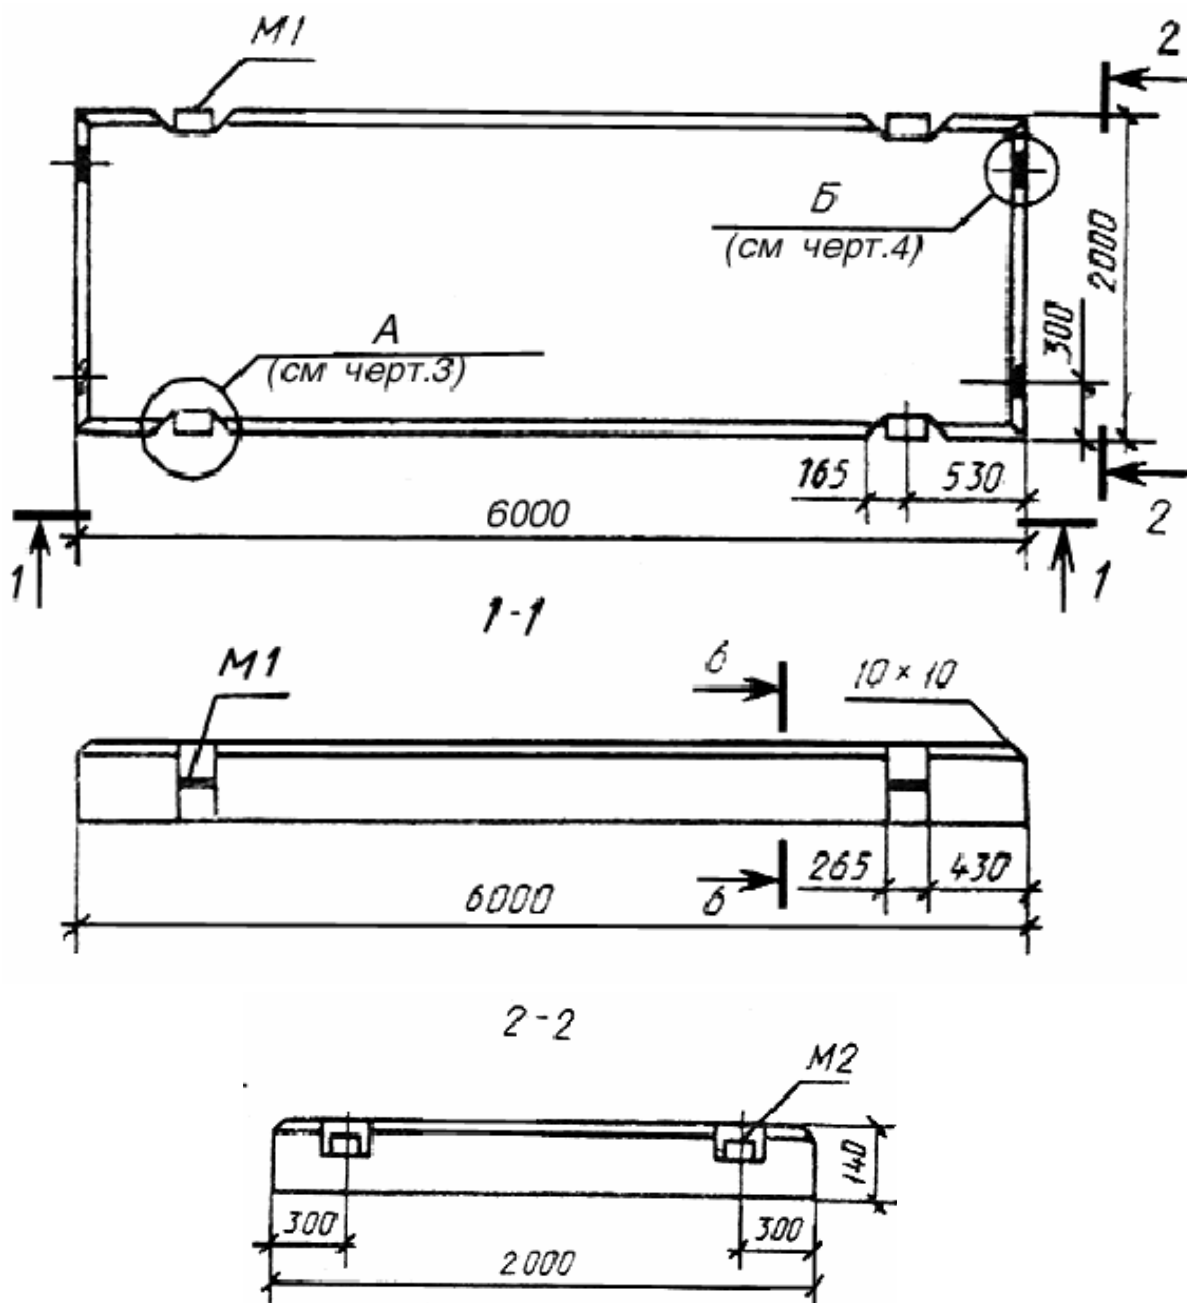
Precast reinforced concrete airfield plate PAG-14
